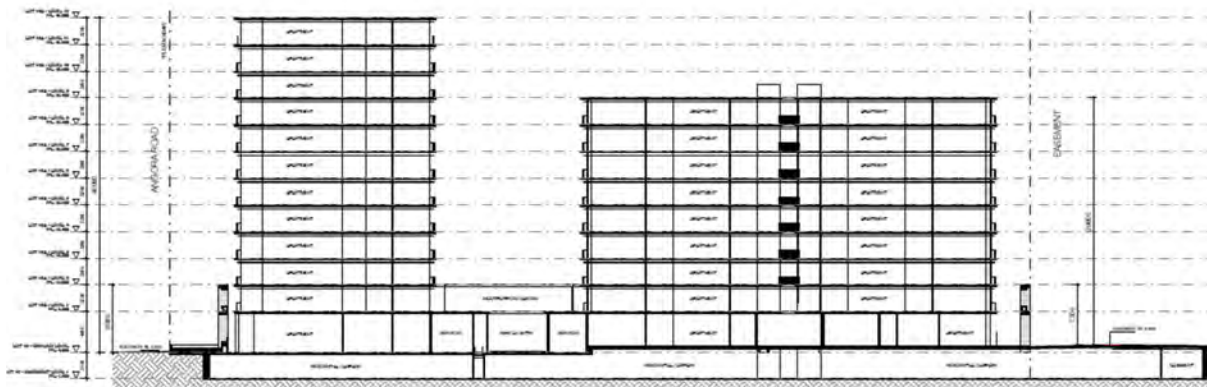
Extract from proposed development Section plan (Carr 24047-TP2-3002).
